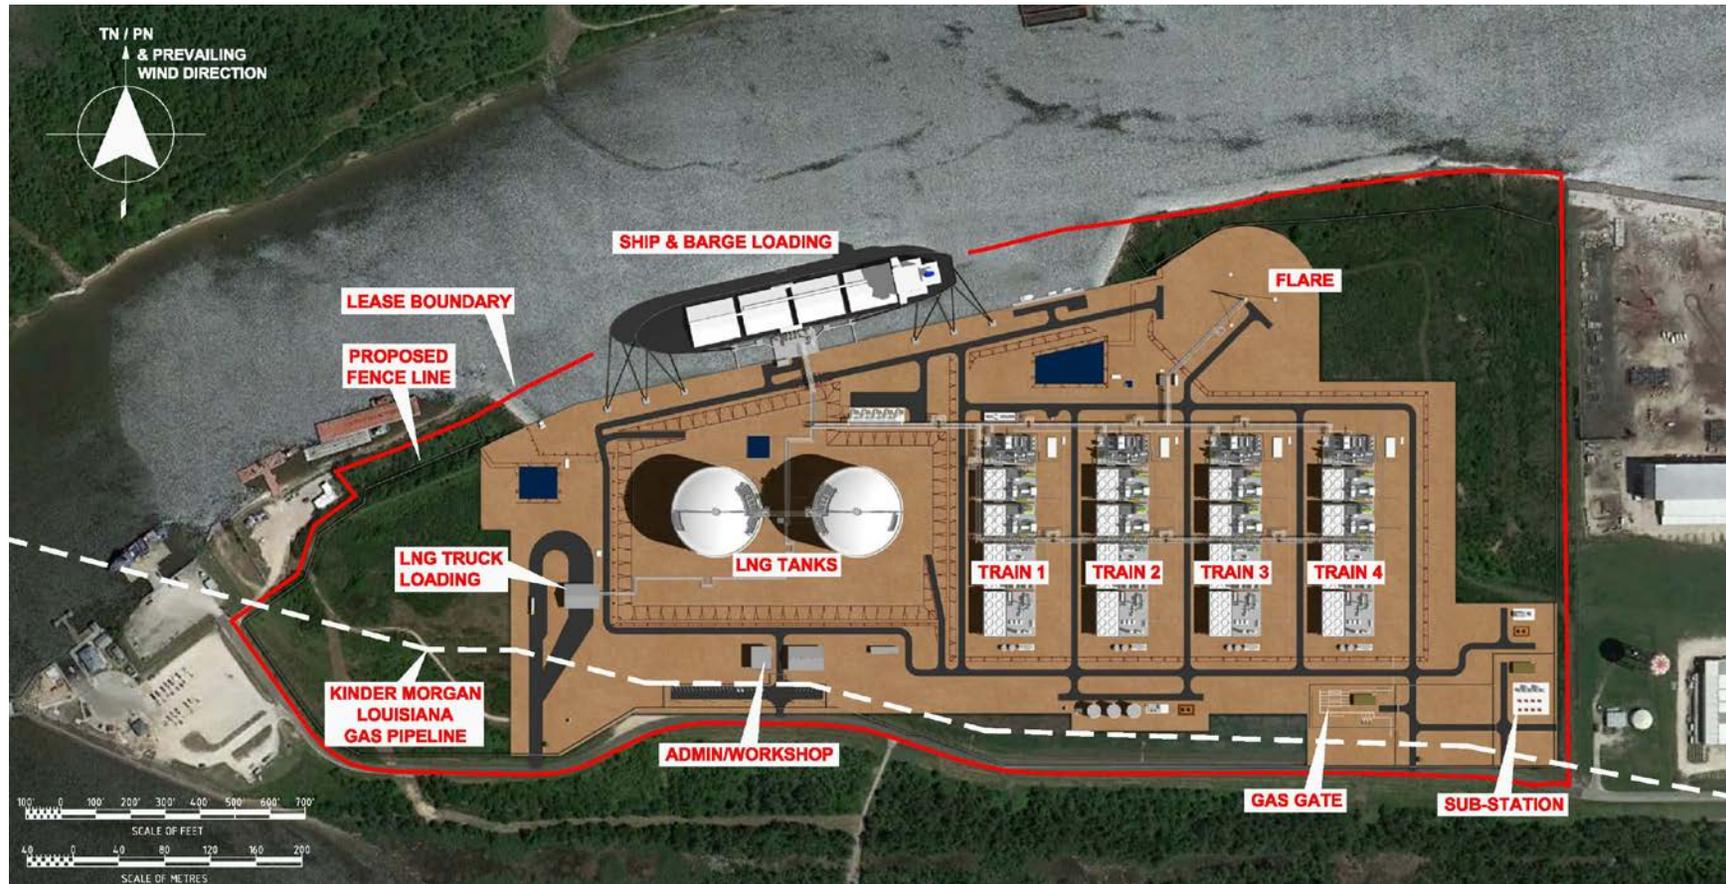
Artist's Rendering of Proposed Facility Layout
